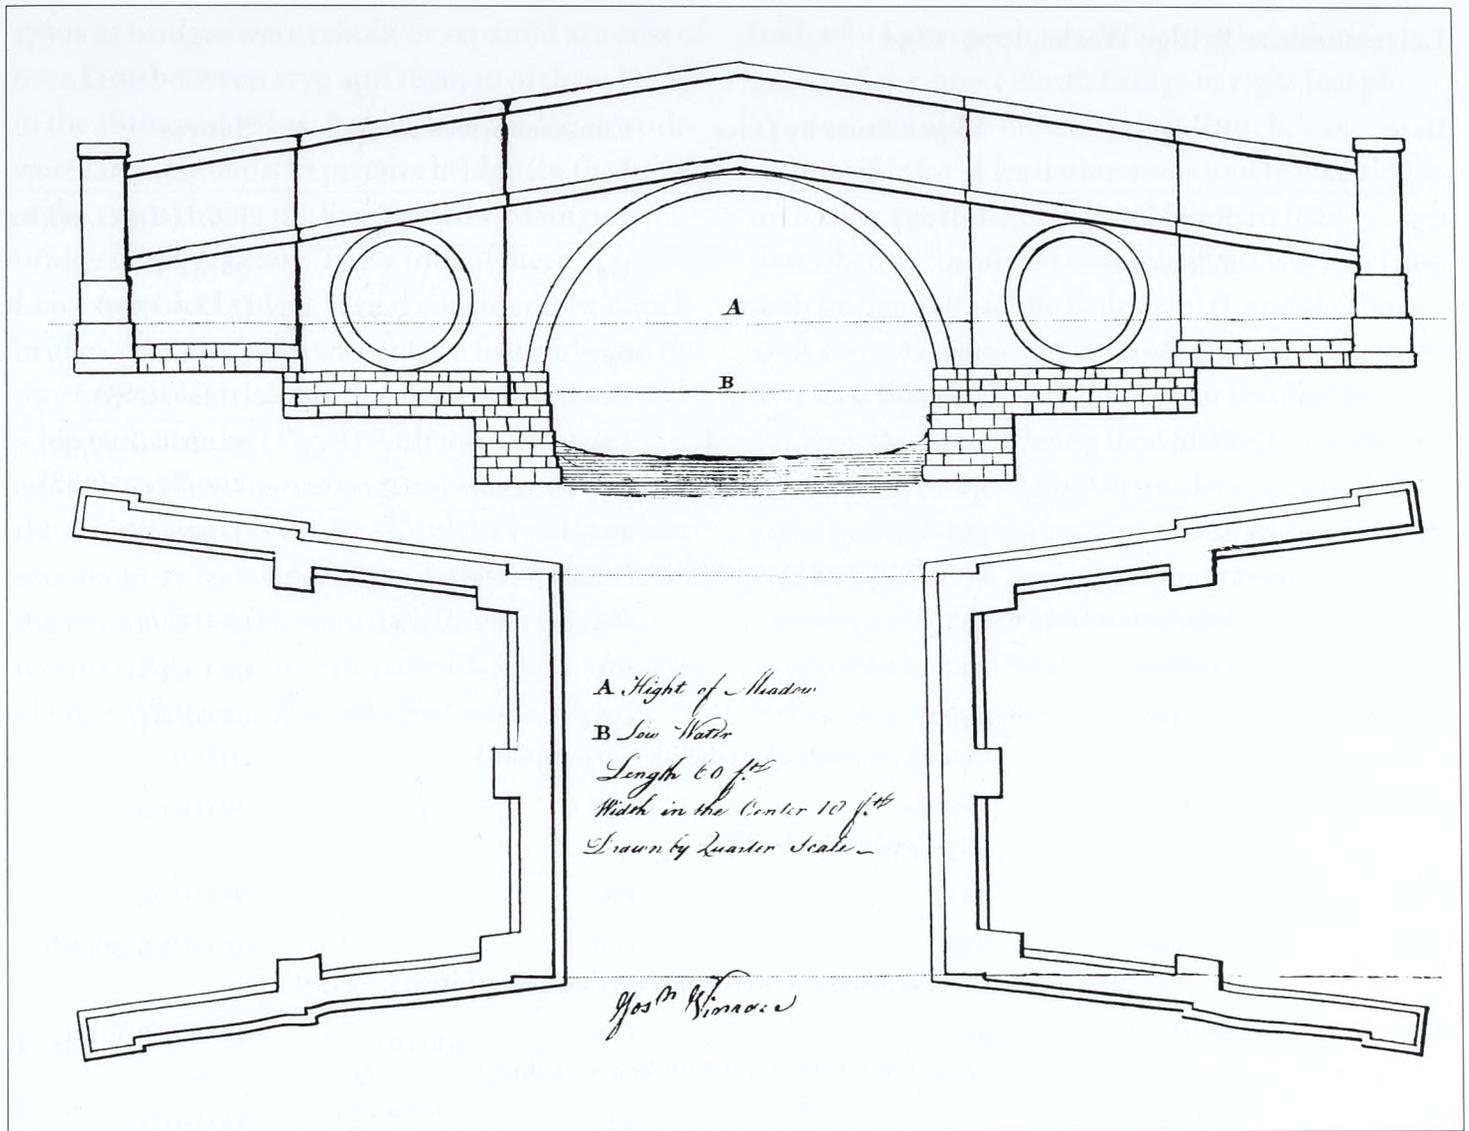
Joseph Vinrace, plan and elevation of Harris's Bridge, 1809. *Leicester Record Office
